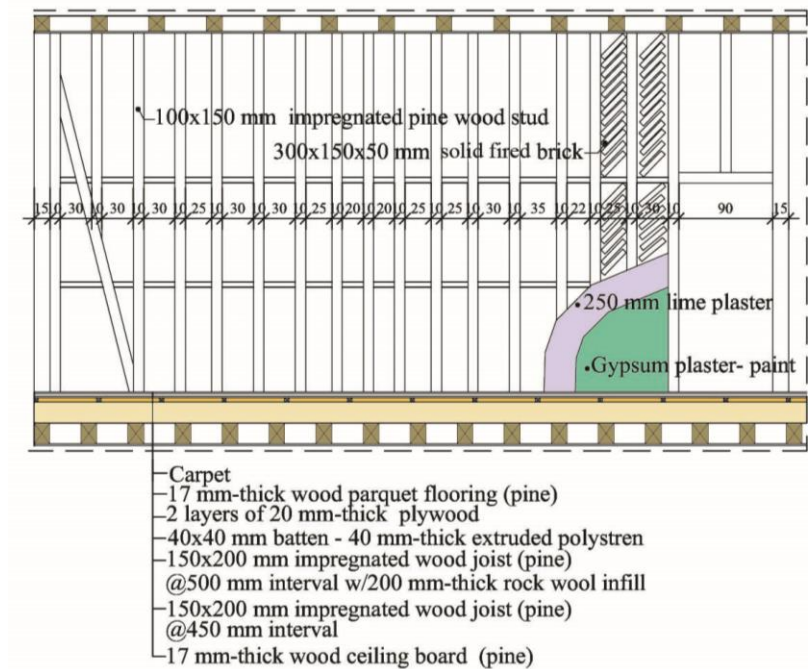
Elevation of Reconstructed-Wall 1 & section of Reconstructed-Floor 1 in 1/50 scale (Drawn by author).
